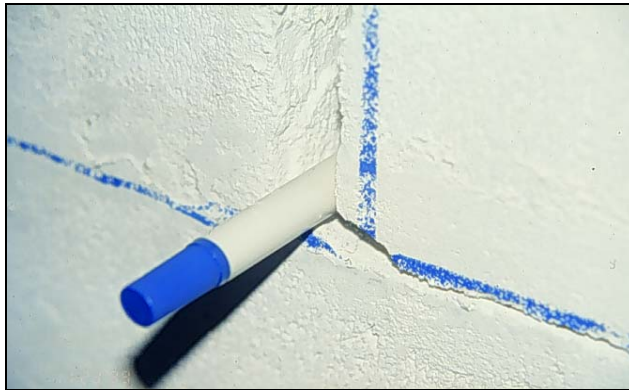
Openings of head and bed joints at the end of the test, Shear Wall Pilot Specimen 1
